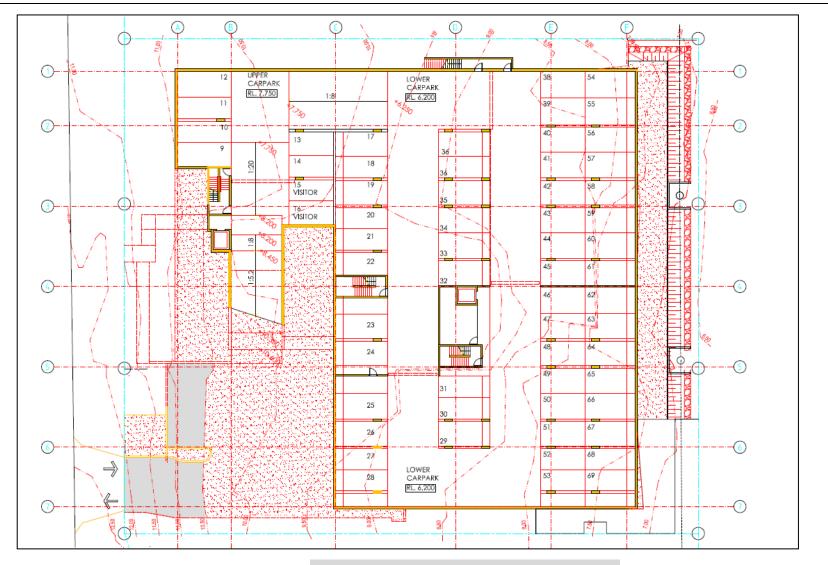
PROPOSED BASEMENT FLOOR PLAN
